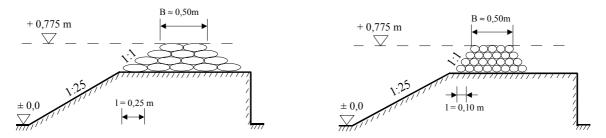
Model construction for hydraulic stability in a scale of 1:8 (LWI flume)
